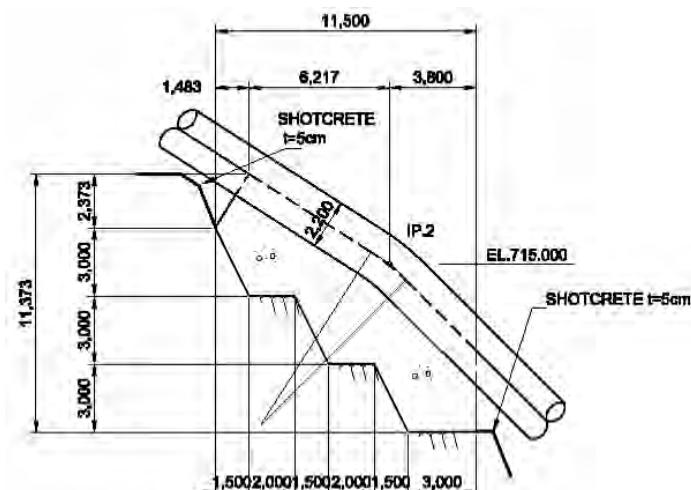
Anchor Block Foundation of the Penstock (IP2)
